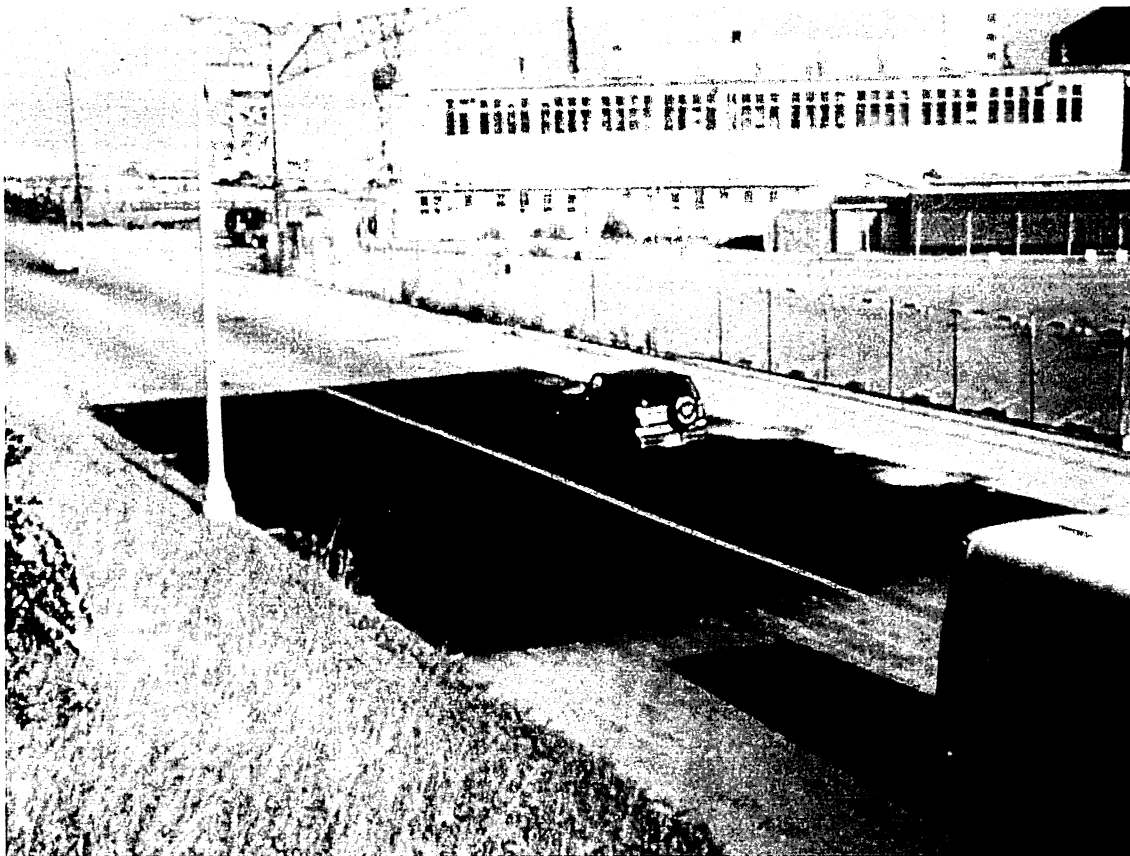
Long-term test strip installed at Hunters Point Annex.
